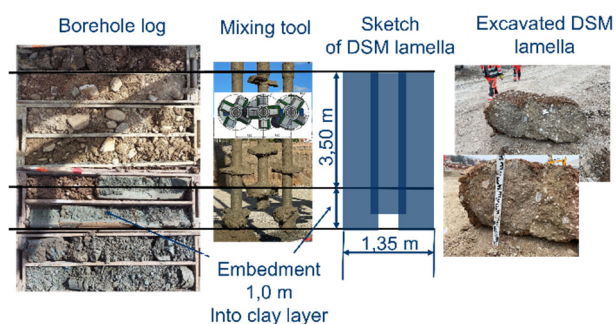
Illustration to preproduction test with photo of relevant bore core (left) scheme of a three-paddle mixing tool (middle); and the excavated body of test lamella (right)
